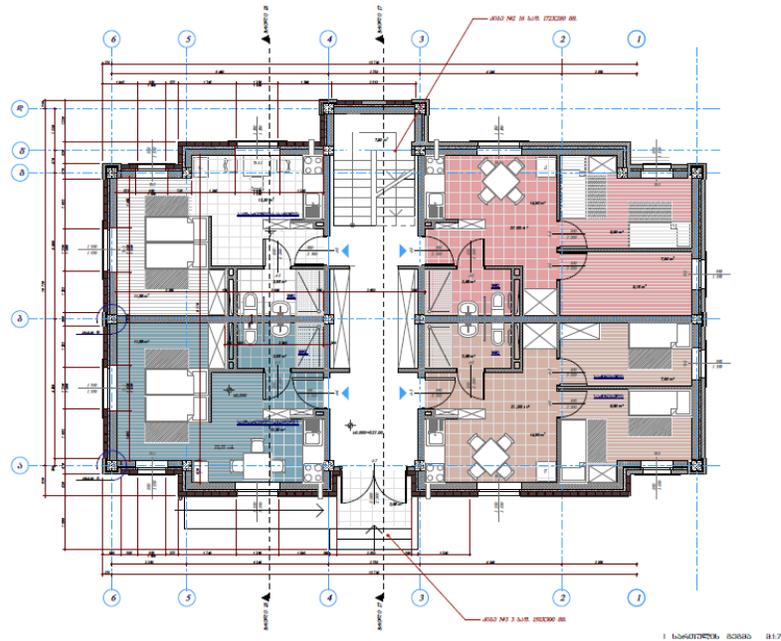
Social Dwelling in Tbilisi, plan of the ground floor
